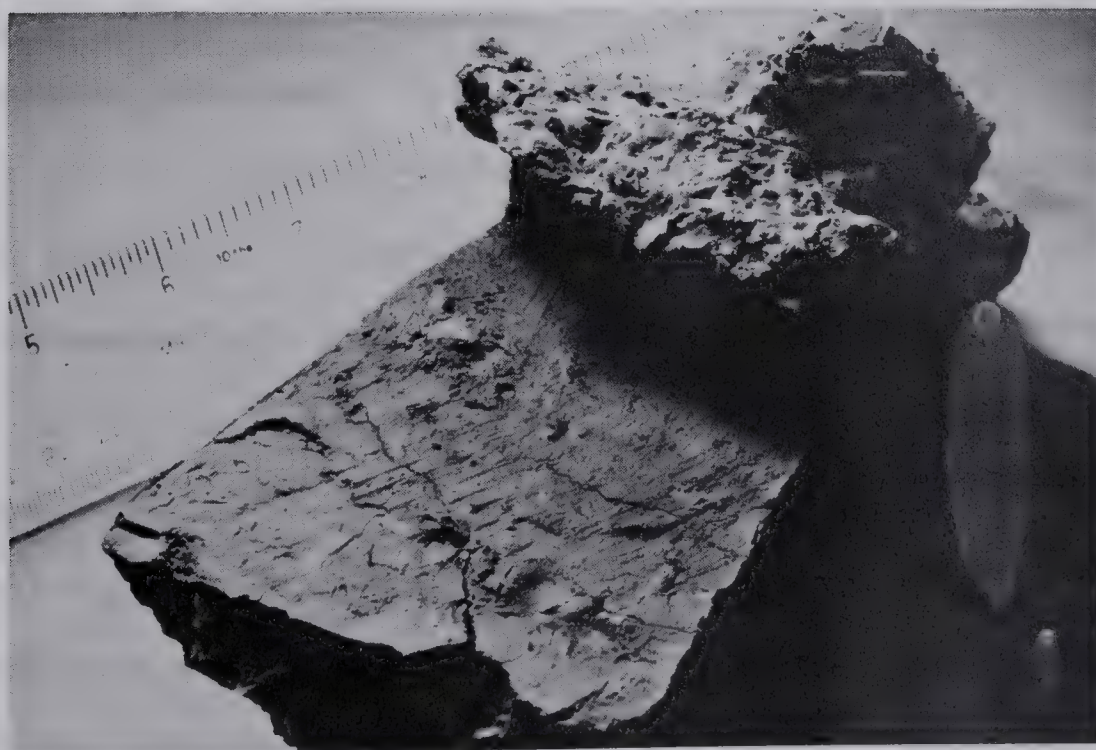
View of the shale-bentonite contact cut from the block sample taken in the west abutment excavation at the Beverly bridge. Note slickensides and striae.
